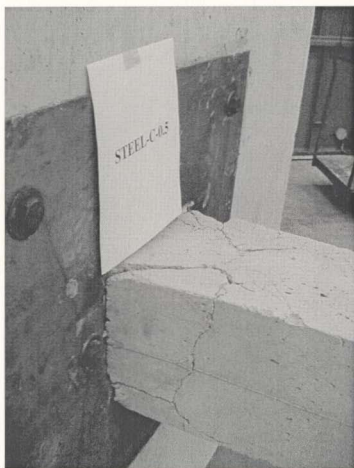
Specimen Steel-C-0.5% after final testing.
